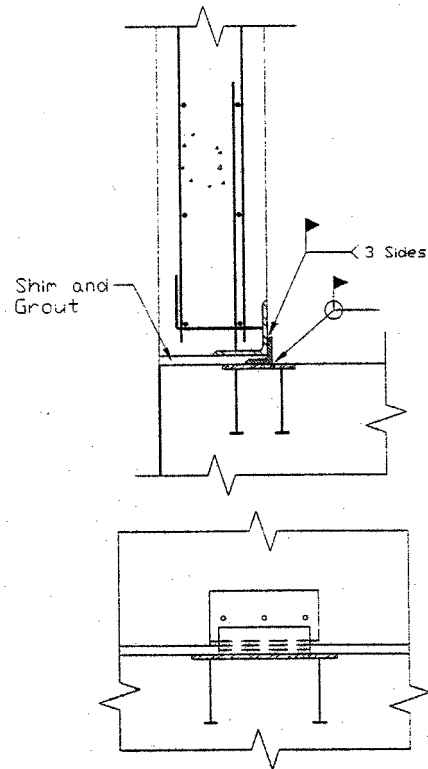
Center Wall to Wall Connection, Floor or Wall Connection, or Fixed Connection at Exterior Wall
